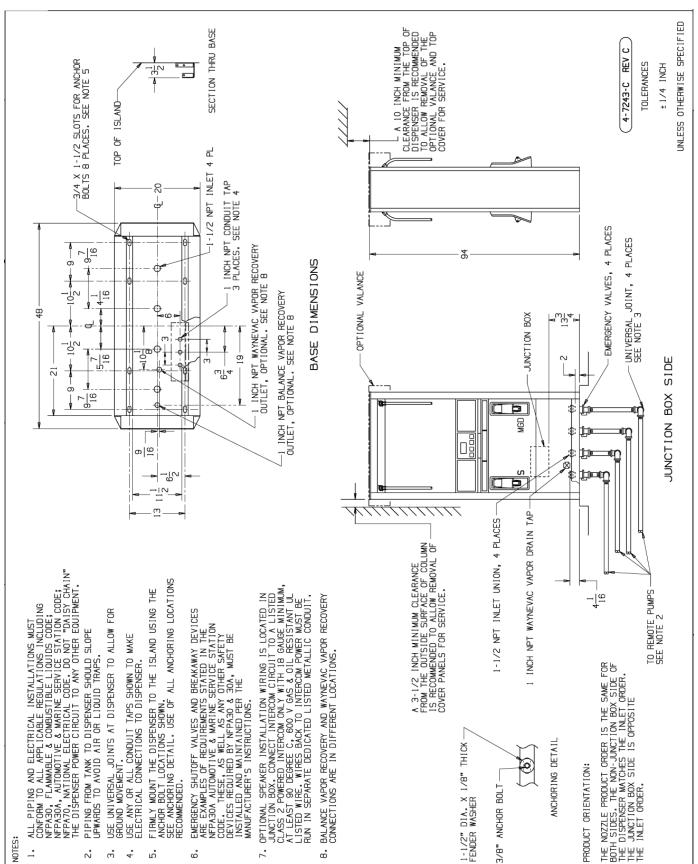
4-7243-C Installation Instructions - 4/V490D/U (Remote)
